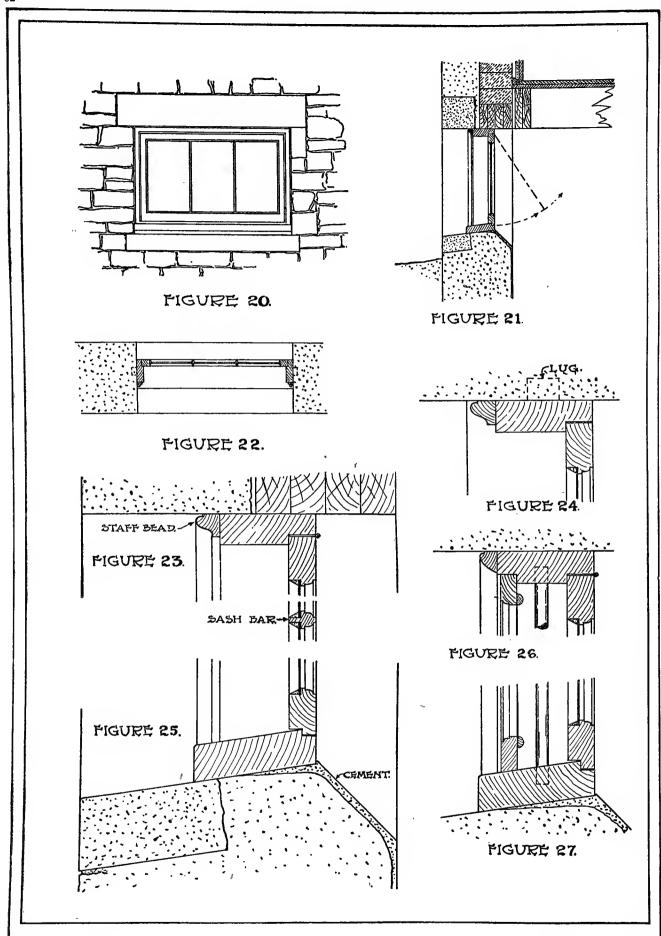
CELLAR WINDOWS IN A STONE WALL
